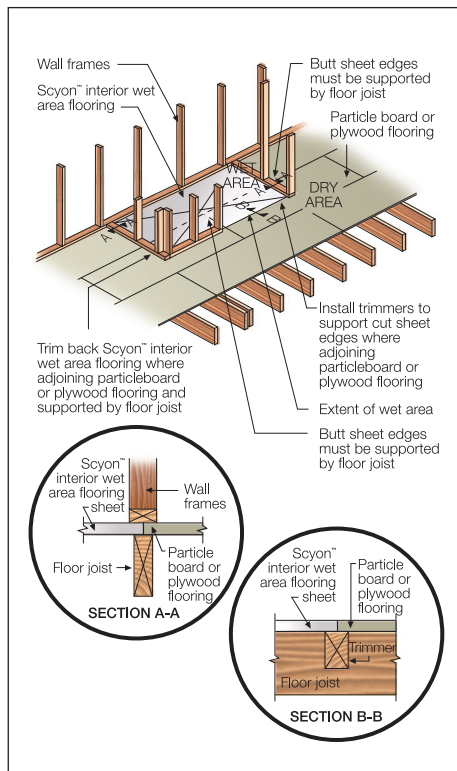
A OPTION 1 - INSTALLING SCYON SECURA WET AREA FLOORING TO EXTENT OF WET AREA
